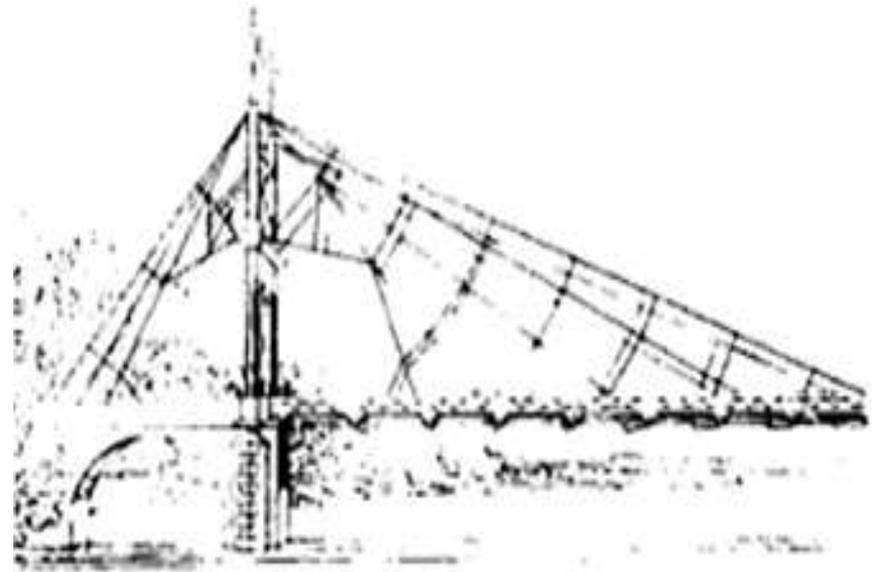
Bridge over the River Saale, Germany, 1824
